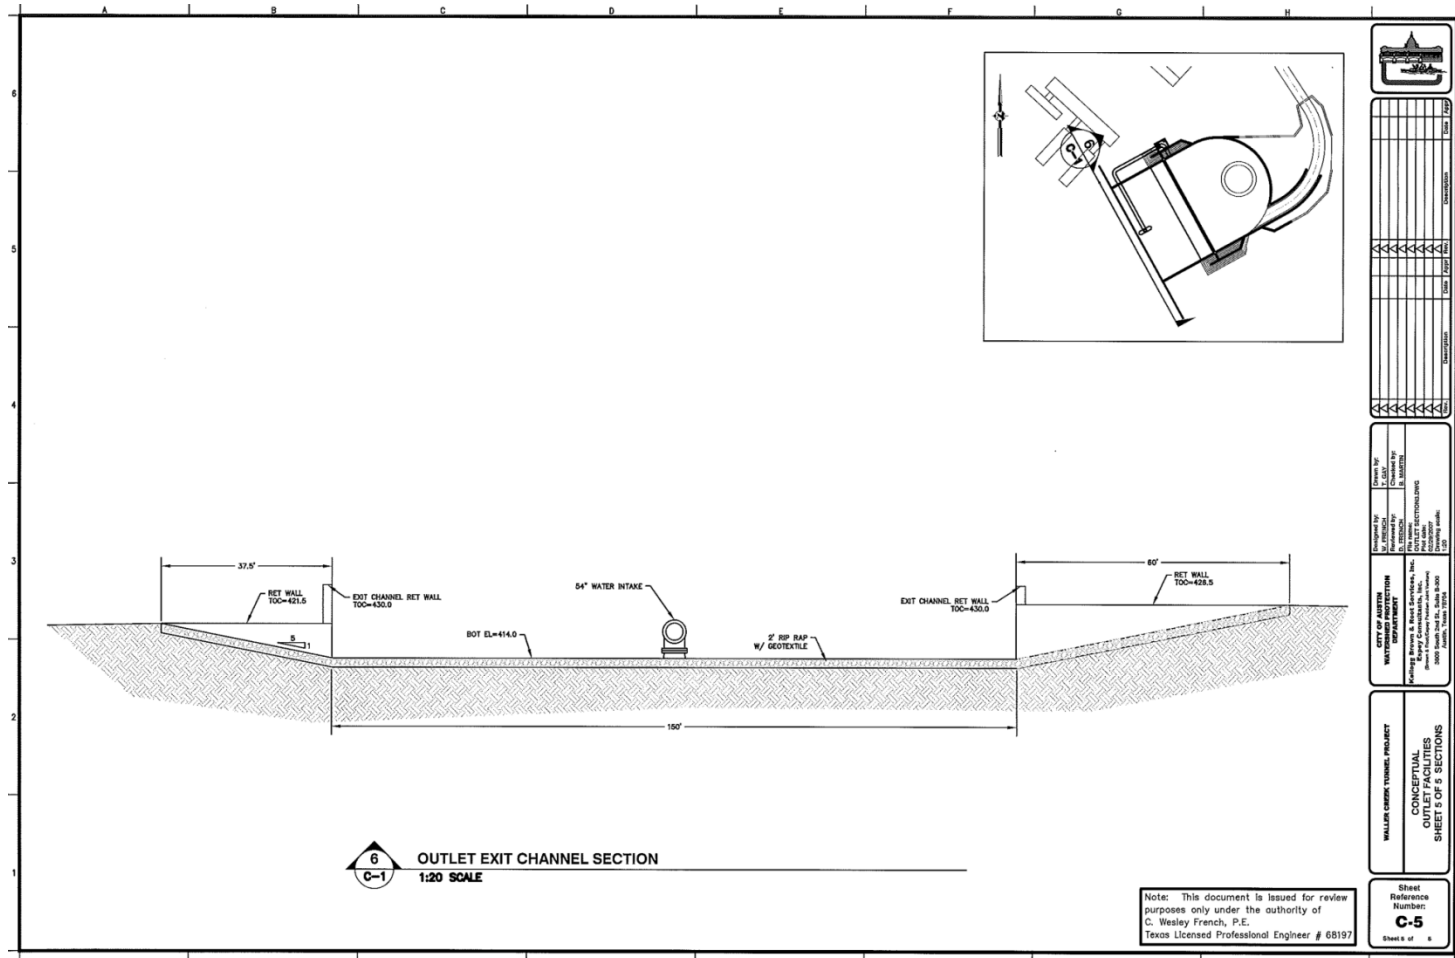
Waller Creek Tunnel Project; Outlet-Section
